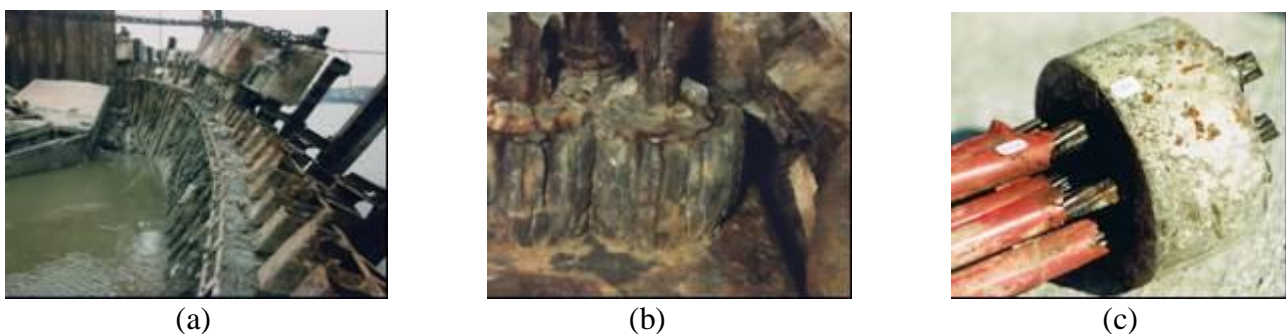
Failure of anchored quay wall (b) corroded barrels and wedges in anchor head (c) lack of corrosion protection behind anchor block (Mothersille, 2006)
